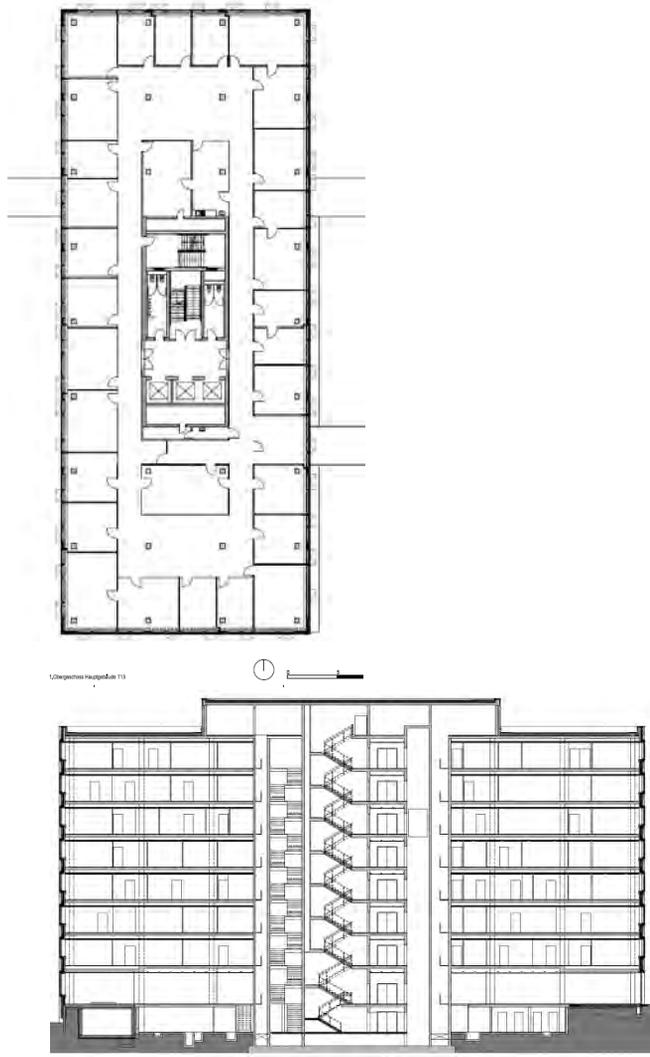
TOP OF IMAGE CONVEYS STANDARD FLOOR PLAN. BOTTOM OF FIGURE ILLUSTRATES THE CROSS SECTION OF THE BUILDING. SOURCE: ATP ARCHITEKTEN INGENIEURE
